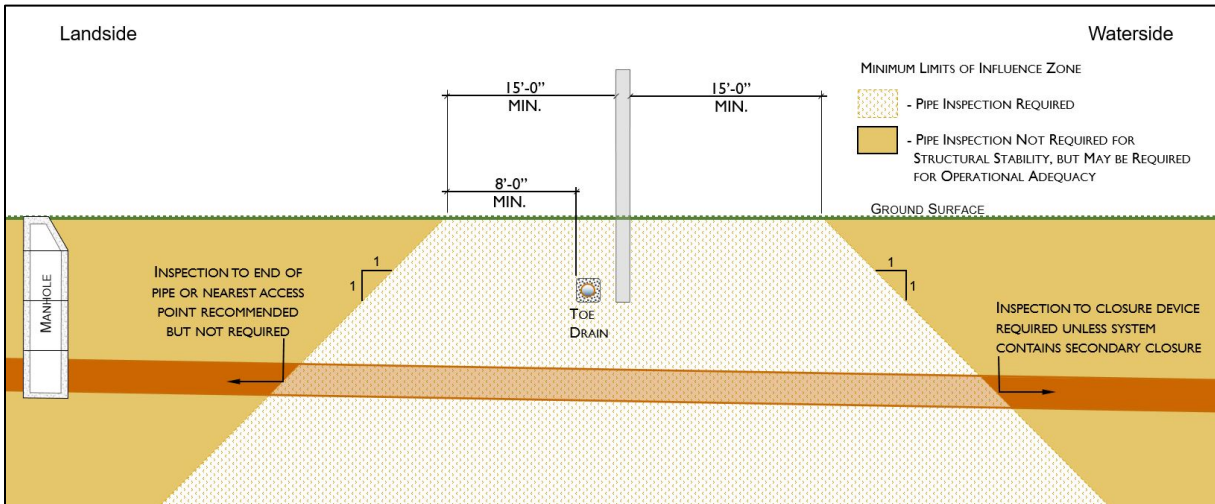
Gravity pipes beneath a floodwall (I-wall).
